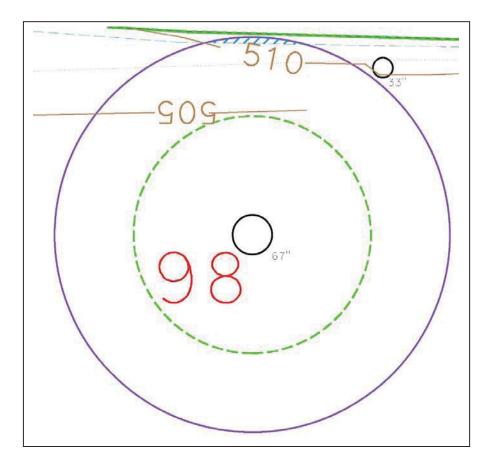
Details of Work: A 6-foot by 6-foot hole would be dug to install a new drain inlet at the road edge, connecting to an existing culvert. An apron of pavement approximately 4 feet wide would be added between the drain inlet and the roadway to direct water to the inlet.
